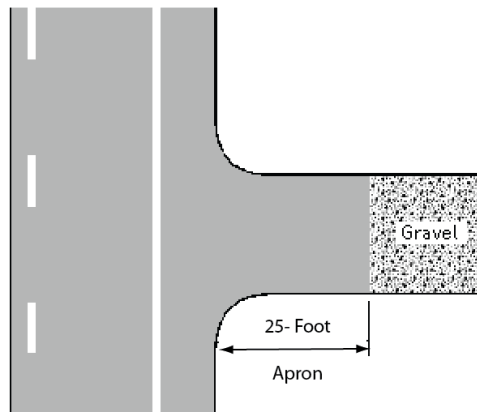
A 25-foot driveway apron is required for parcels not located in a recorded subdivision or parcels used for agricultural purposes.
